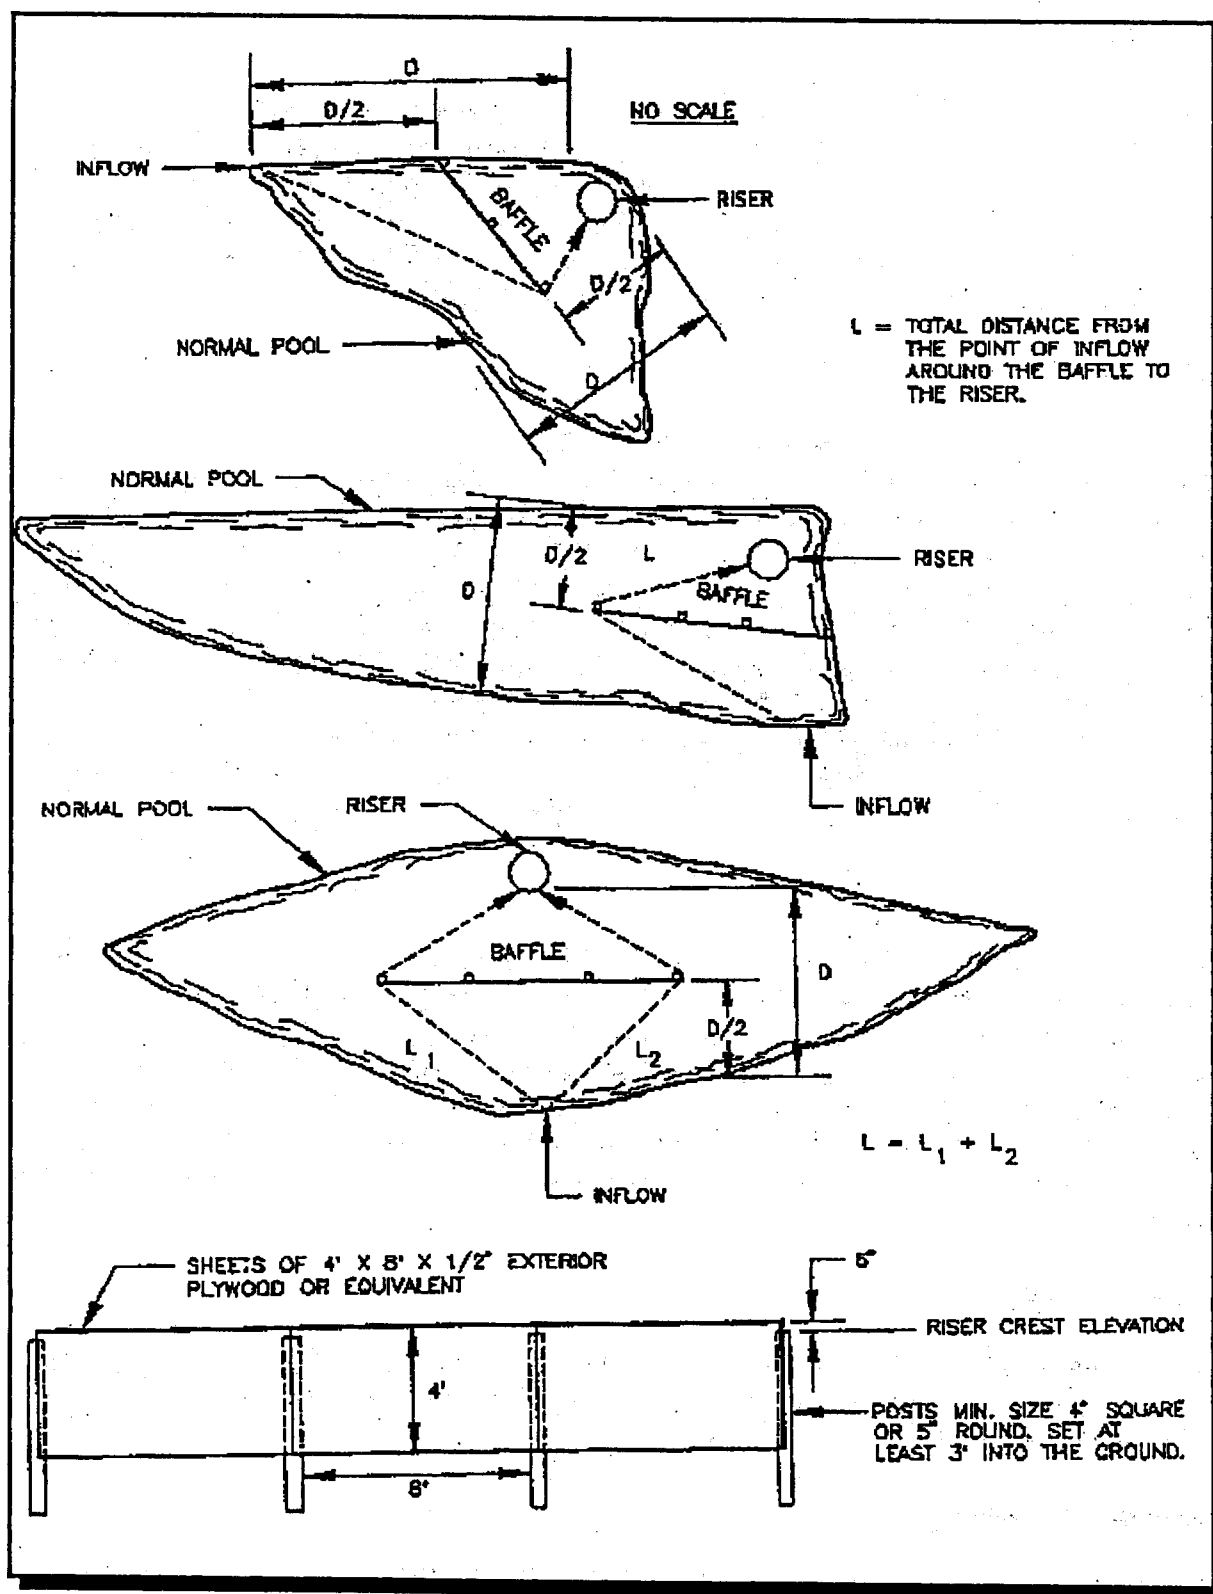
Example Plan Views of Baffle Locations in Sediment Basins
